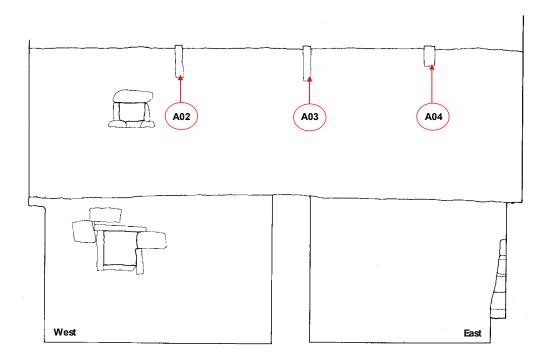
Drawing of north wall interior to show sample locations (after Plowman Craven & Associates, architects)
